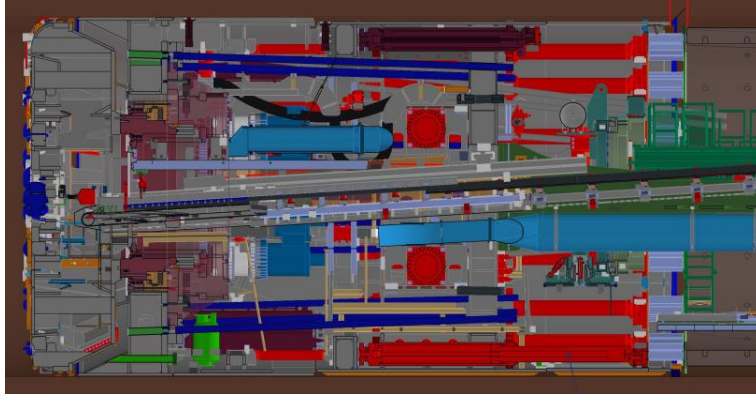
Installation thrust cylinders extensions ("HK 5102-091-001-01 Shield Disassembly", Herrenknecht, 2022)
